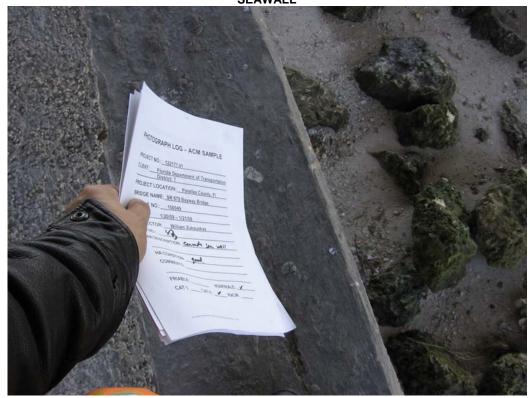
01/21/09 - SAMPLE 4.3 - HA 4 CONCRETE SEAWALL
